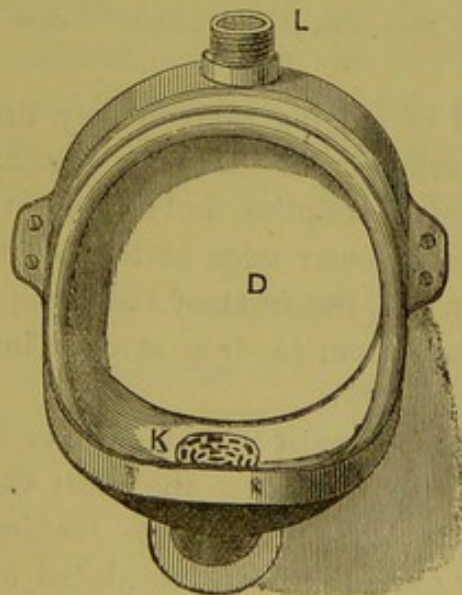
Front View of the Registered "Wide-fronted" Urinal Basin.
